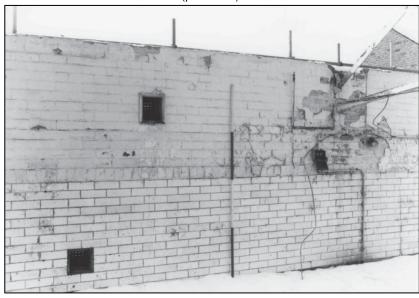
Building A, 1F, showing typical glazed brick height, looking W (photo 8/17).
